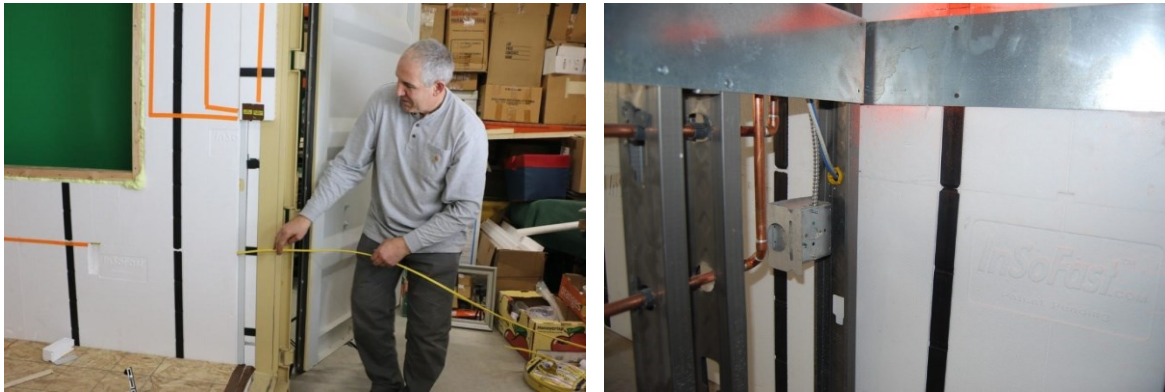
Installation of electrical services of container architecture (InSoFast, 2023)
